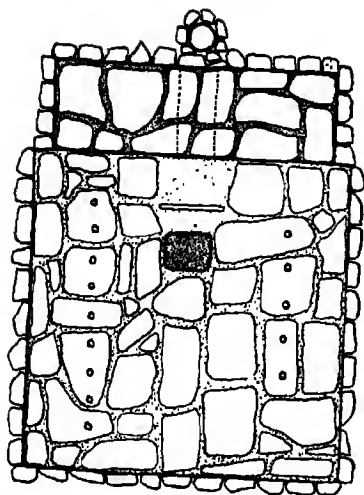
Kiva type characteristic of the Hopi area. All are rectangular, have a short bench at one end, ventilator, deflector, and firepit. Many have loom holes in the stone flagging floor.
